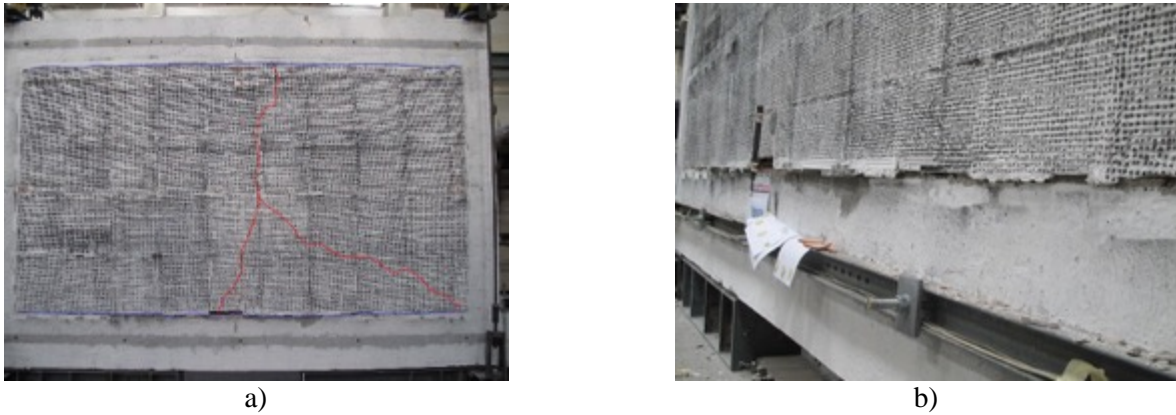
Inf_01: a) Cracking pattern; and b) Detachment observed between the panel and the bottom beam.
